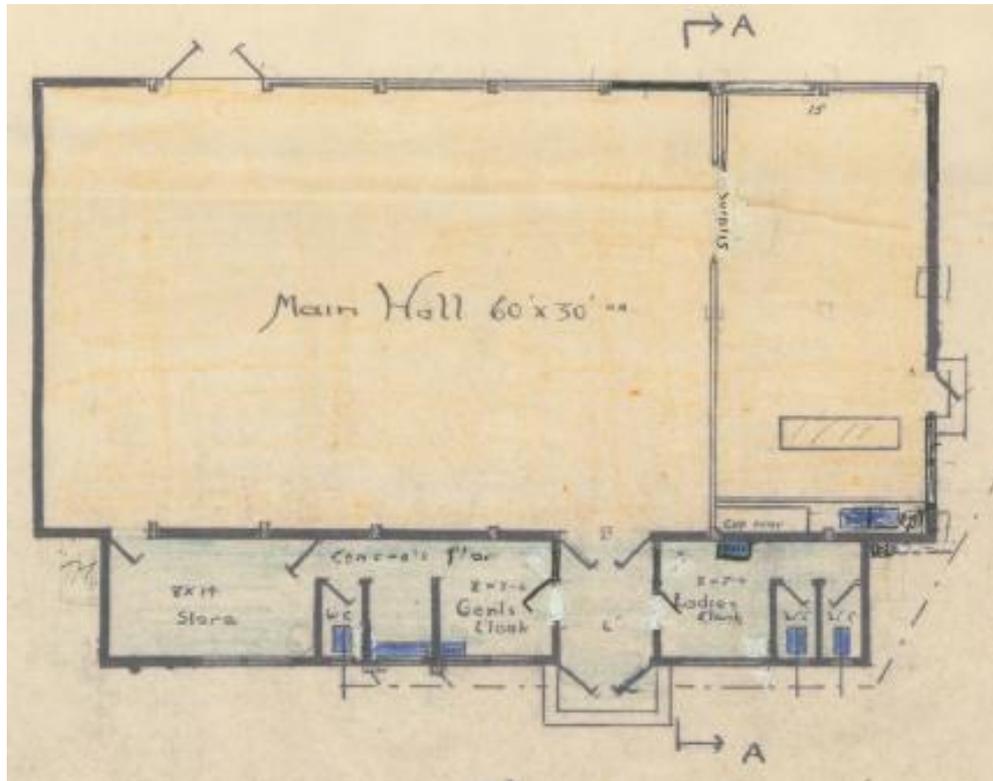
Plan Sketch Showing Main and Toilet Area as per Original Drawings (1963)
